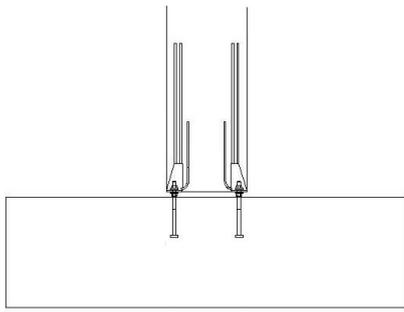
(a) Column fixed by means of anchor bolts and column shoes
